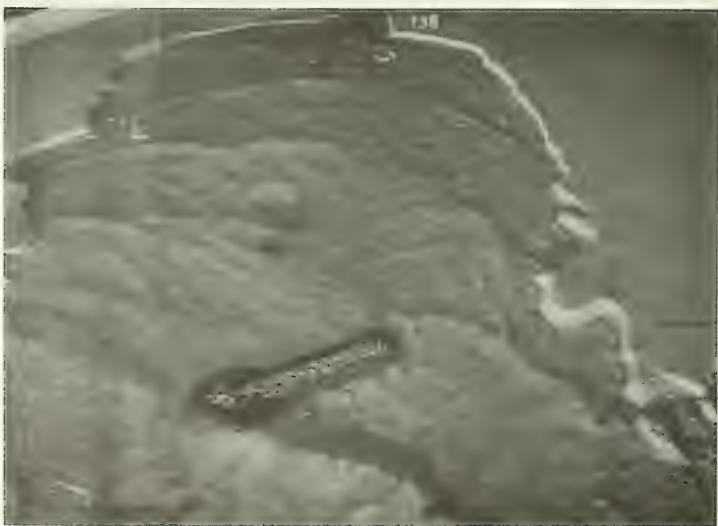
Typical wave patterns for the offshore breakwater plan; 17-sec, 22-ft waves from northwest; swl = +7.0 ft
